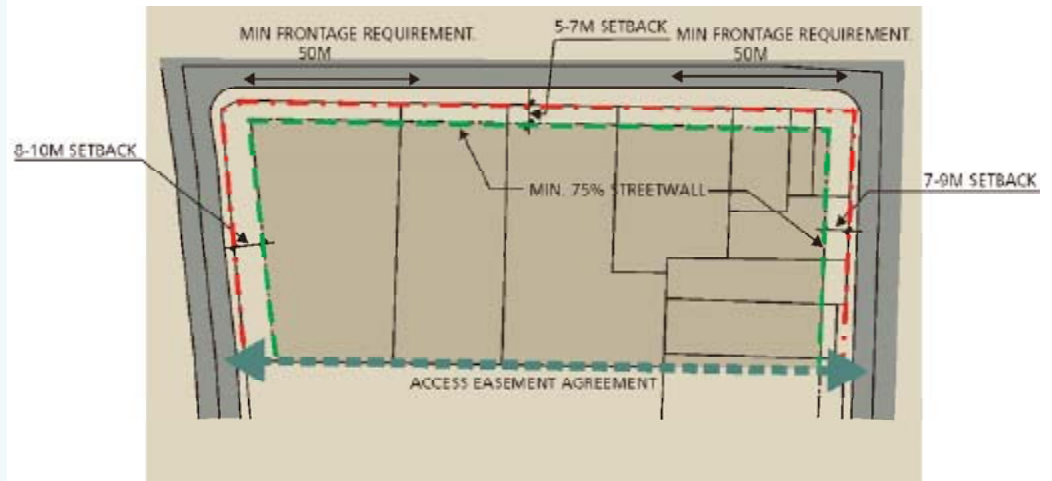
Setback & Streetwall Requirements Diagram, N.T.S.
